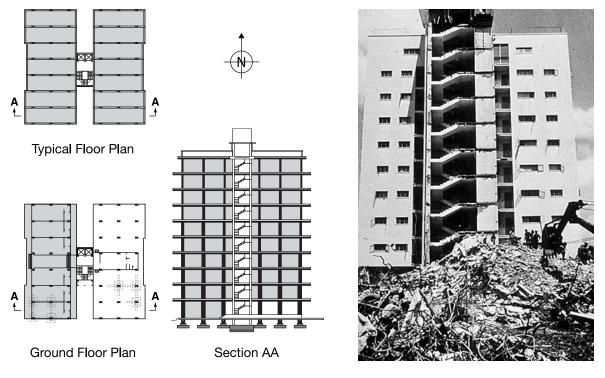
Architectural plans of the Palace Corvin building and photo illustrating the west wing that survived the earthquake without collapsing but that had to be demolished (Photo: Vitelmo V. Bertero).
